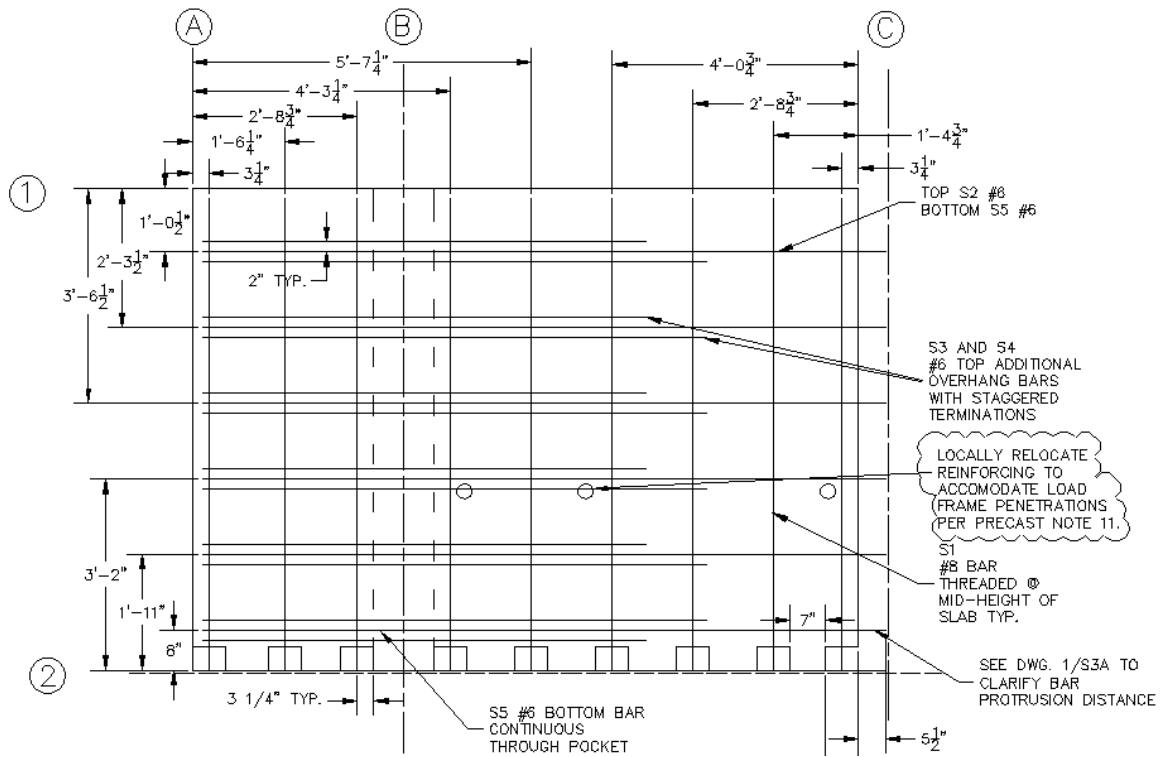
Typical Full-Depth Panel Reinforcing Plan
